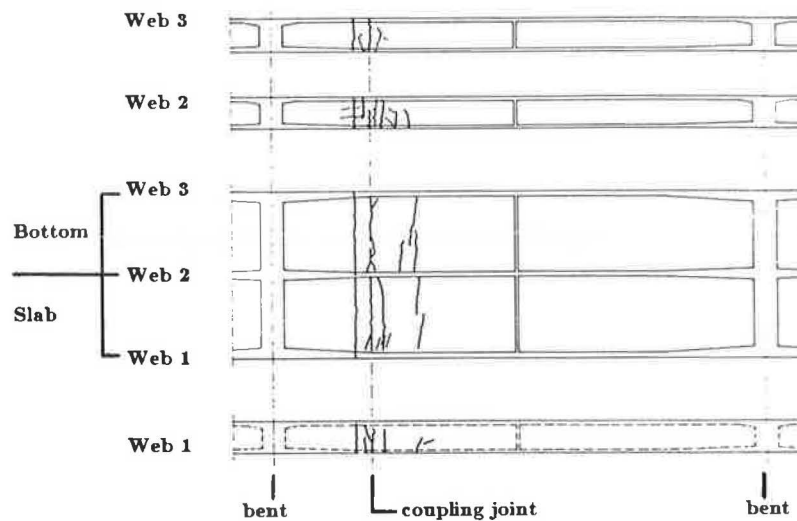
Example of crack development in a two-cell box-girder span with coupling joint.
